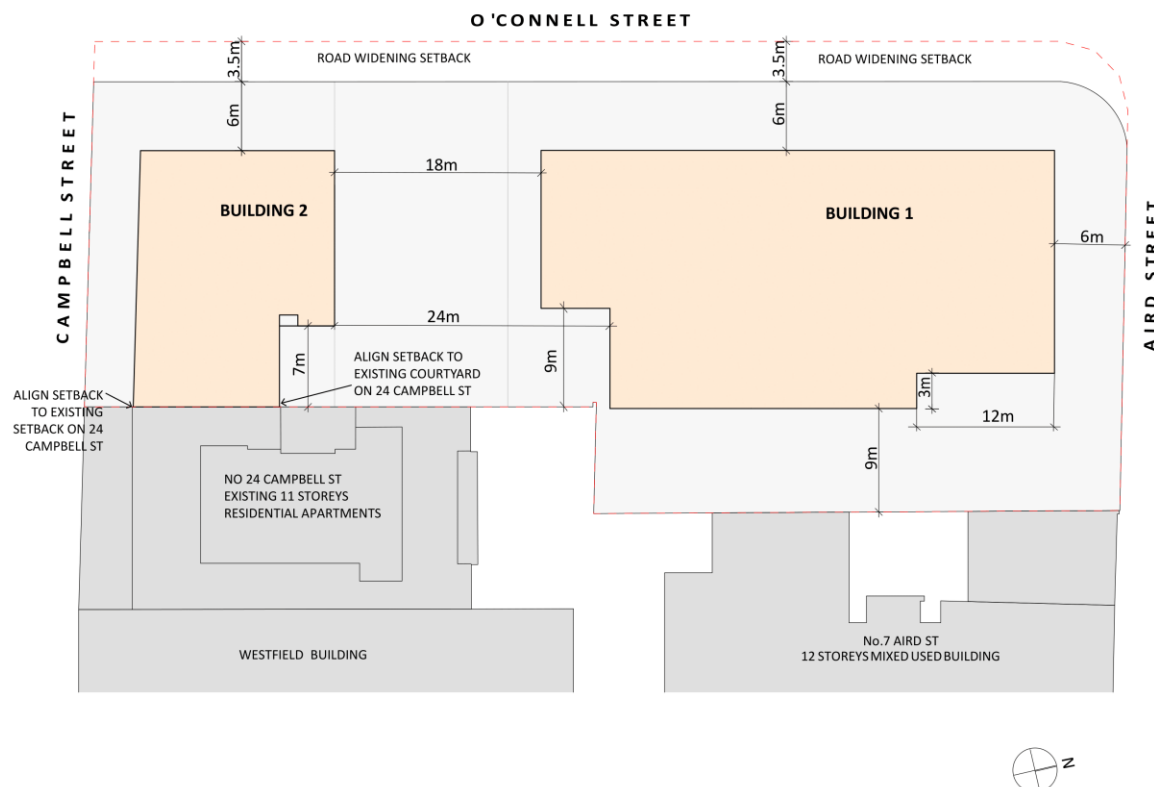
Building Envelope controls (extracted from draft DCP in Attachment 1)
